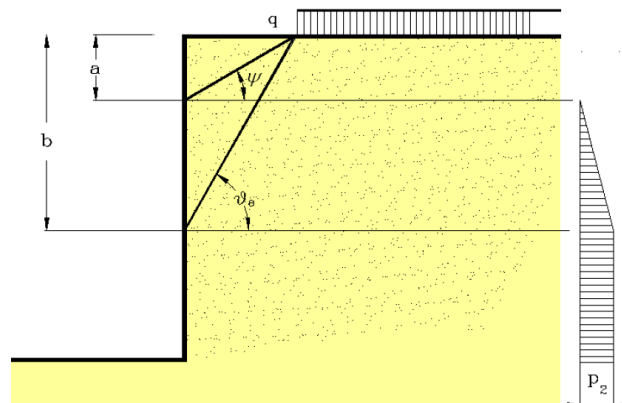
Infinite surface load at a distance of a wall (Manual of Hydraulic Structures, 2017)
